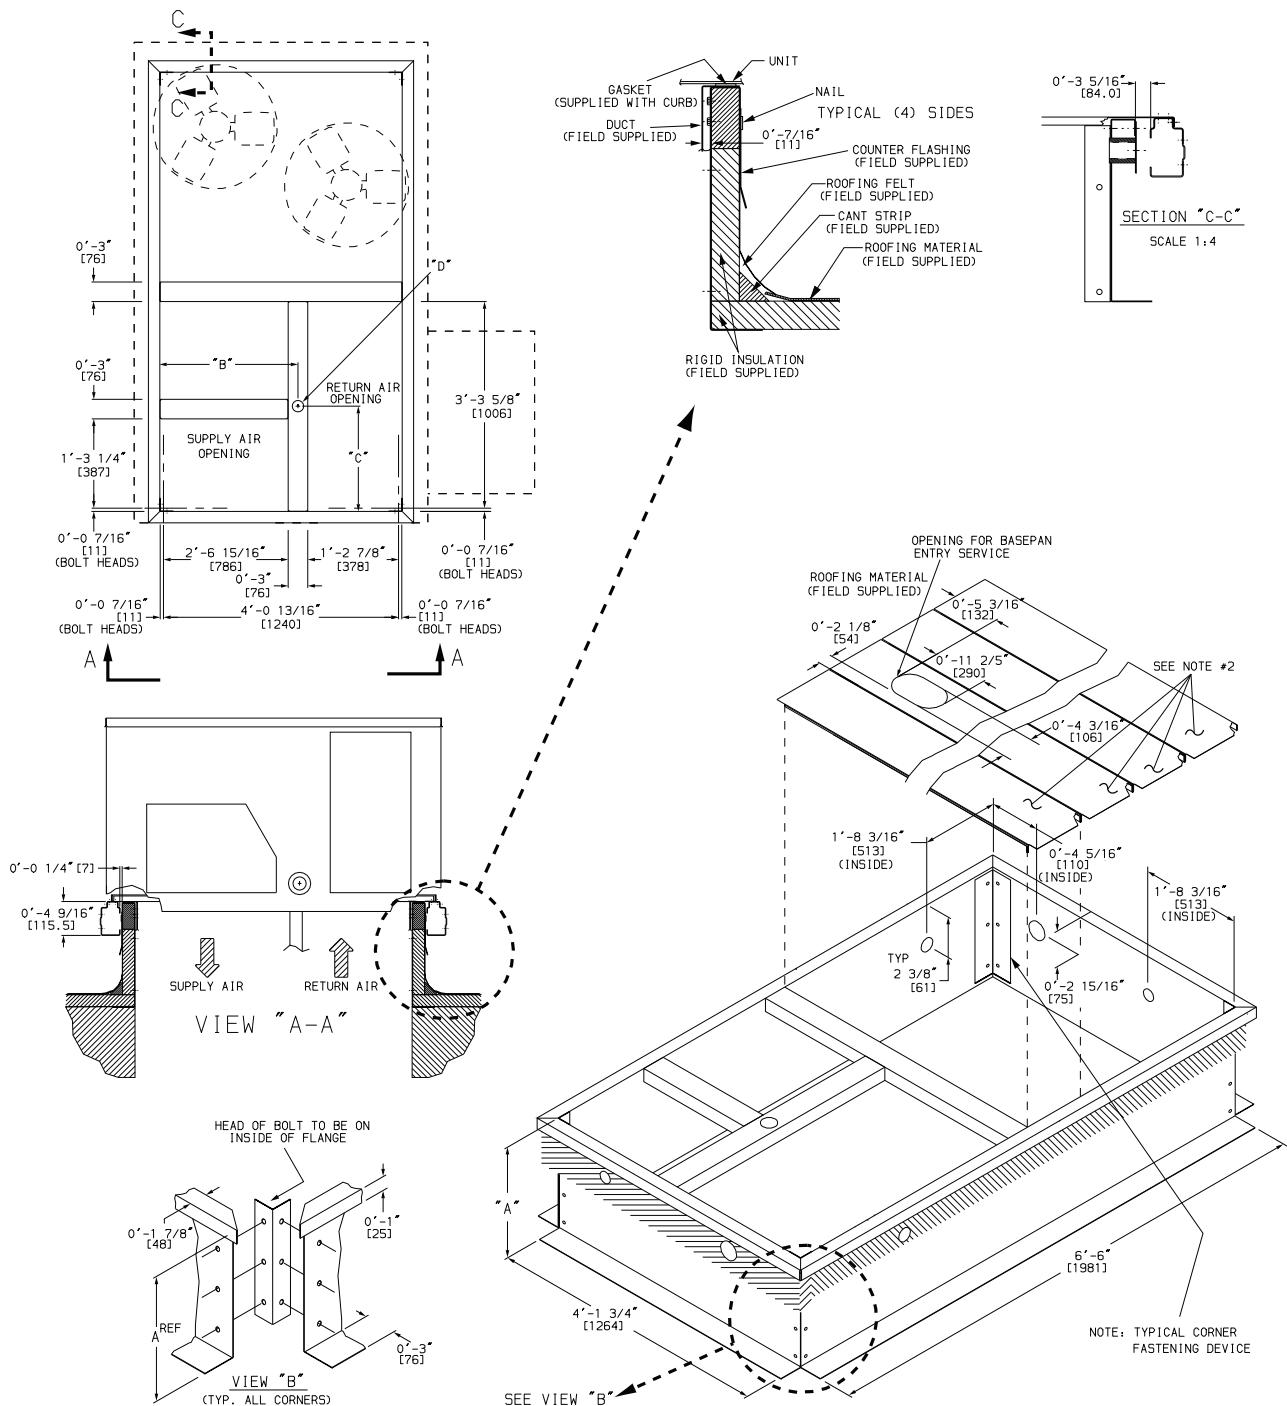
50HC07-12 Roof Curb Dimensions
